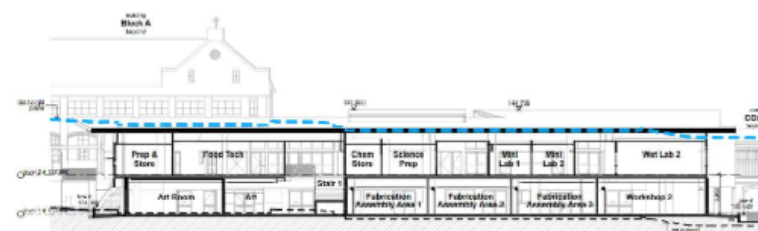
Long section from Marie Street (Source: Stanton Dahl Architects)
